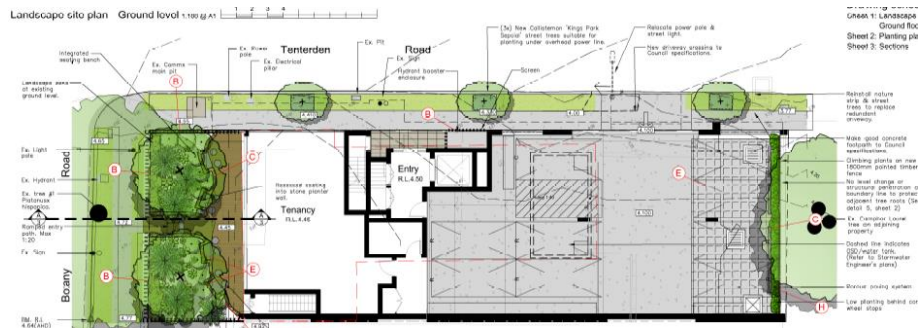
Excerpt of Landscape Plan and planting to Ground Floor Level
